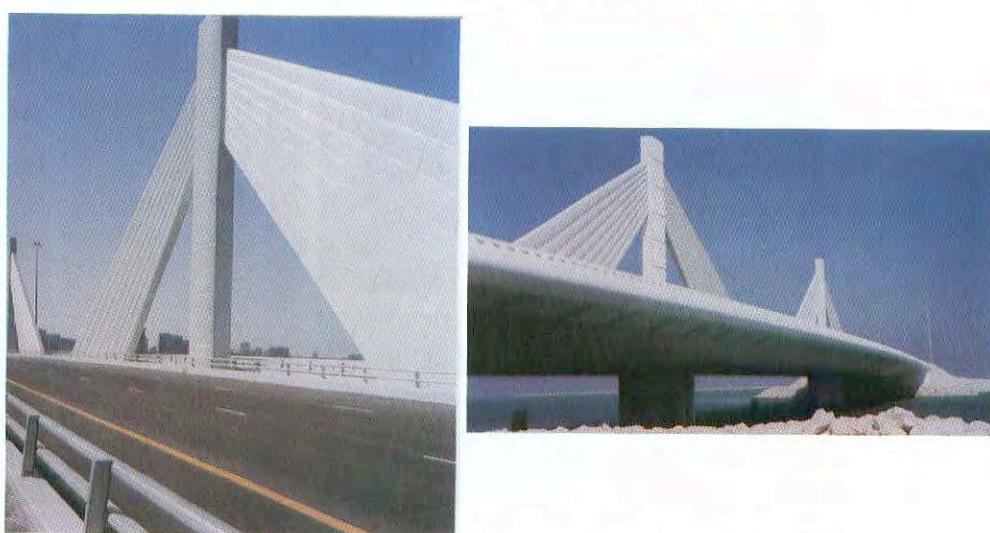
Shaikh Isa Salman Bridge – State of Bahrain [14]
